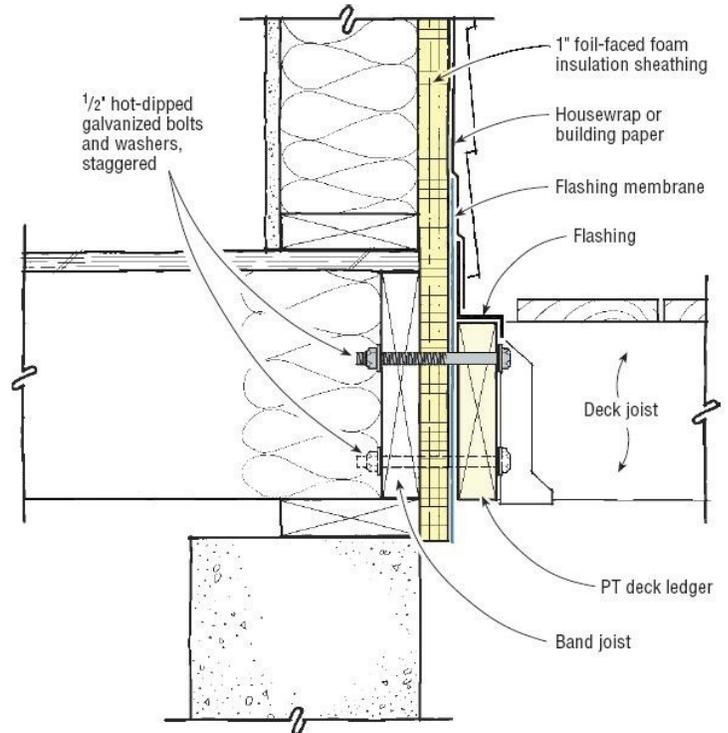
Attaching Ledger to Band Joist Over Structural Sheathing
